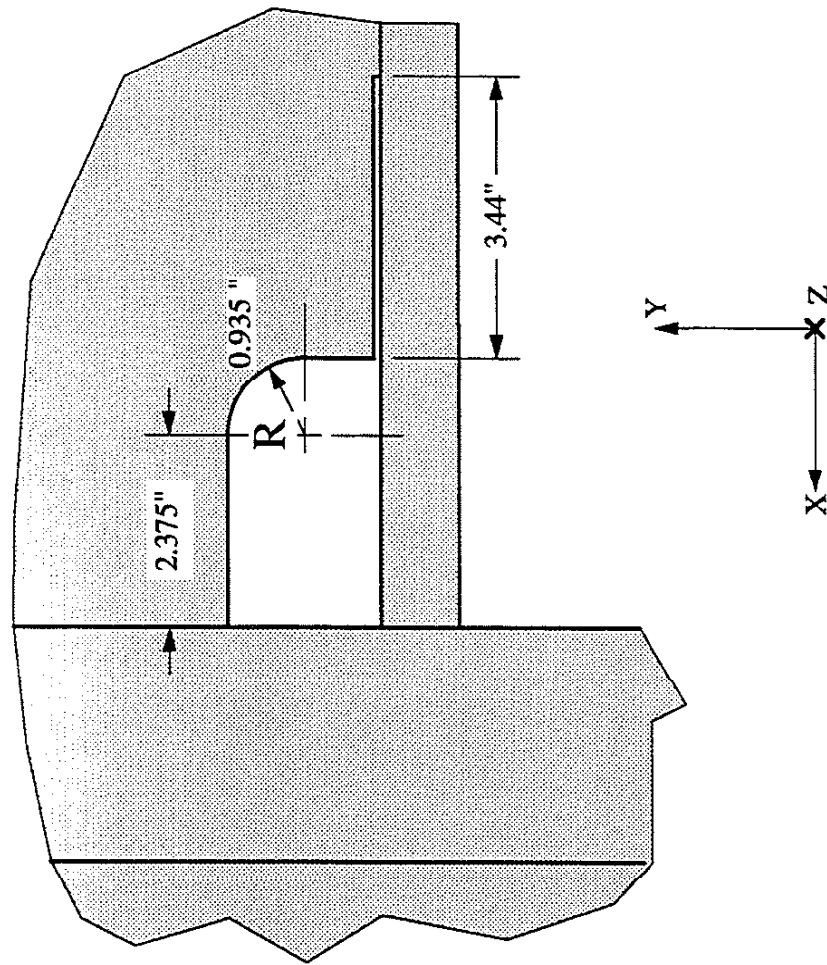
The details of the beam-to-column connection in which the beam flange and web were separated.
